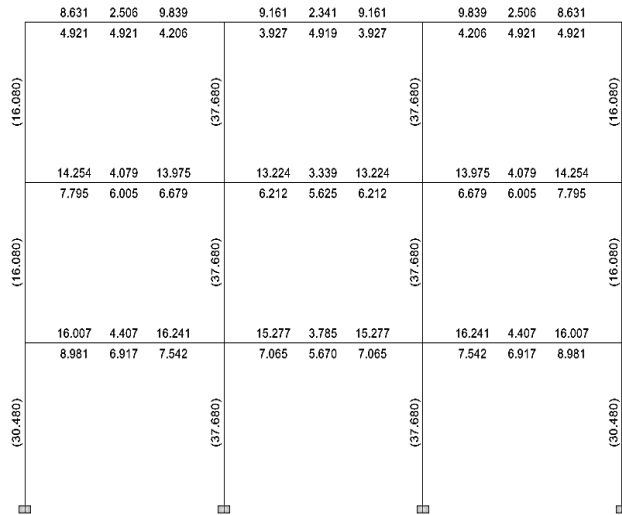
(b) Design longitudinal reinforcement area in a perimeter frame of the 3-story model (cm²)
